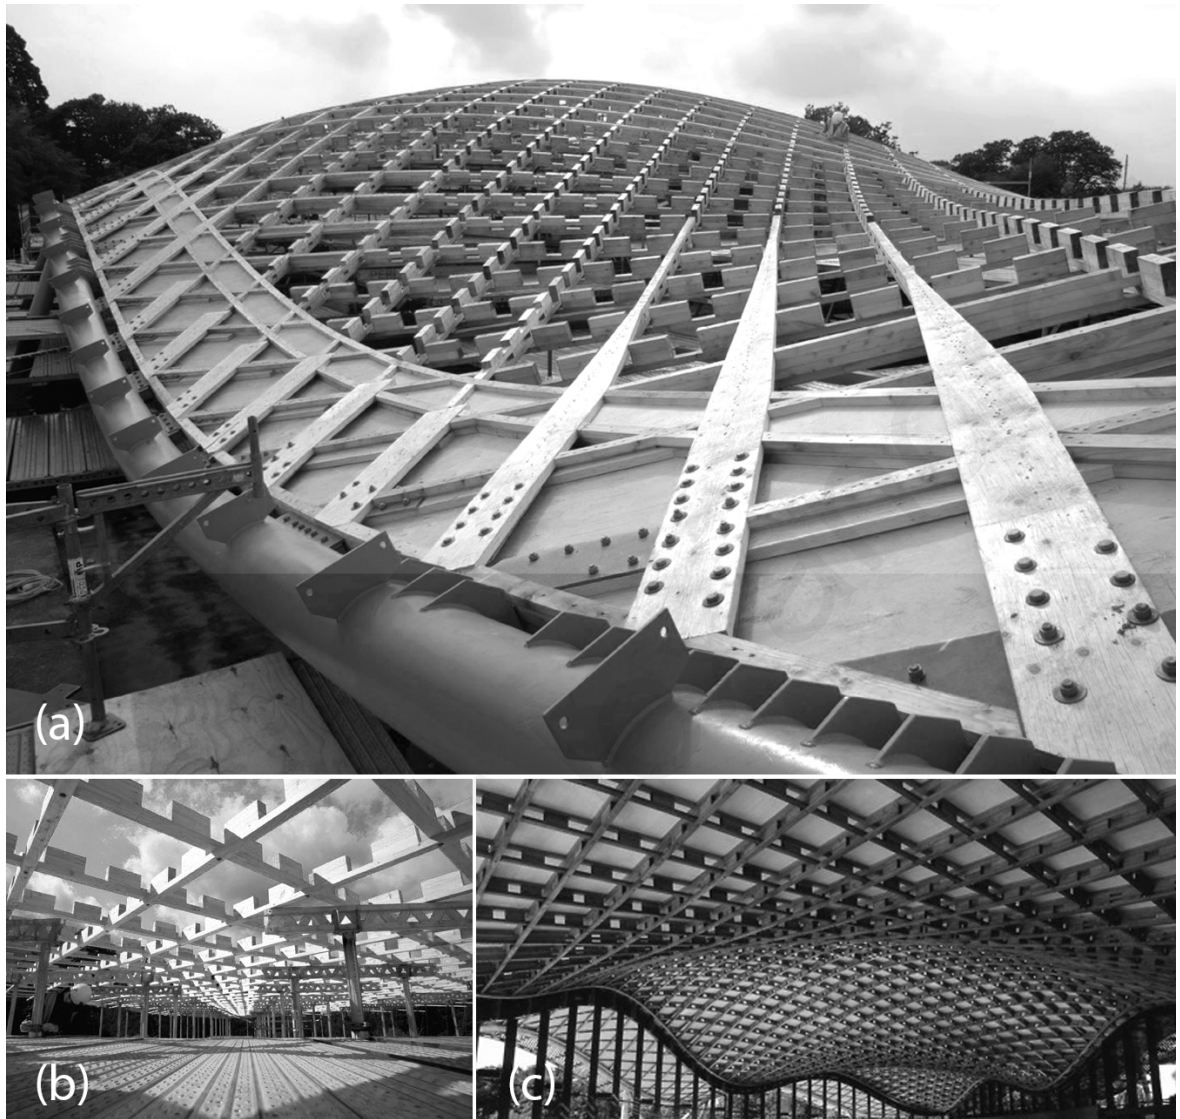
Savill Garden Gridshell, Windson, U.K., 2006; Architect: Glenn Howells Architects; Structural engineer: BuroHappold (Harris and Roynon, 2008)
